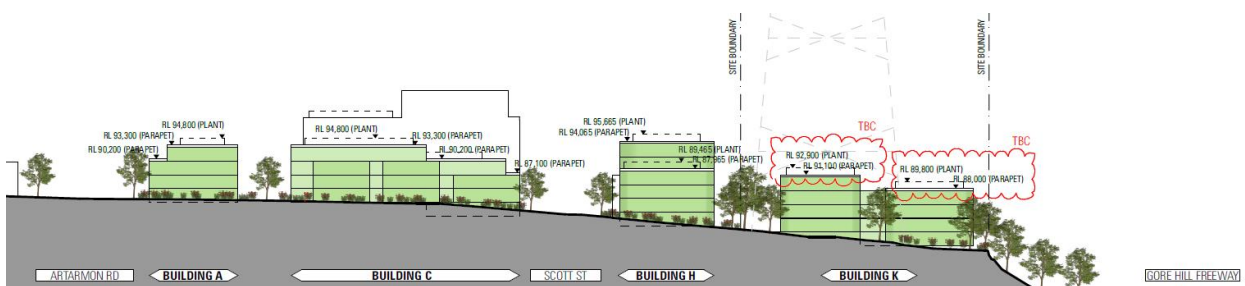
Extract of Proposed Street Elevation – Richmond Avenue
